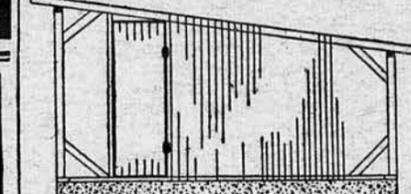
Detail of frame construction of end of laying house showing concrete foundation.
